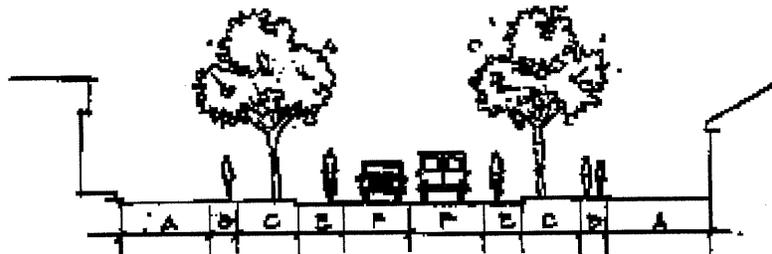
Schematic sketch of a typical collector street cross-section. Table 1 lists the recommended dimensions of each component: A) building setback from street right-of-way; B) walkway; C) planting area; D) parking lane; E) bicycle lane; F) travel lane.
